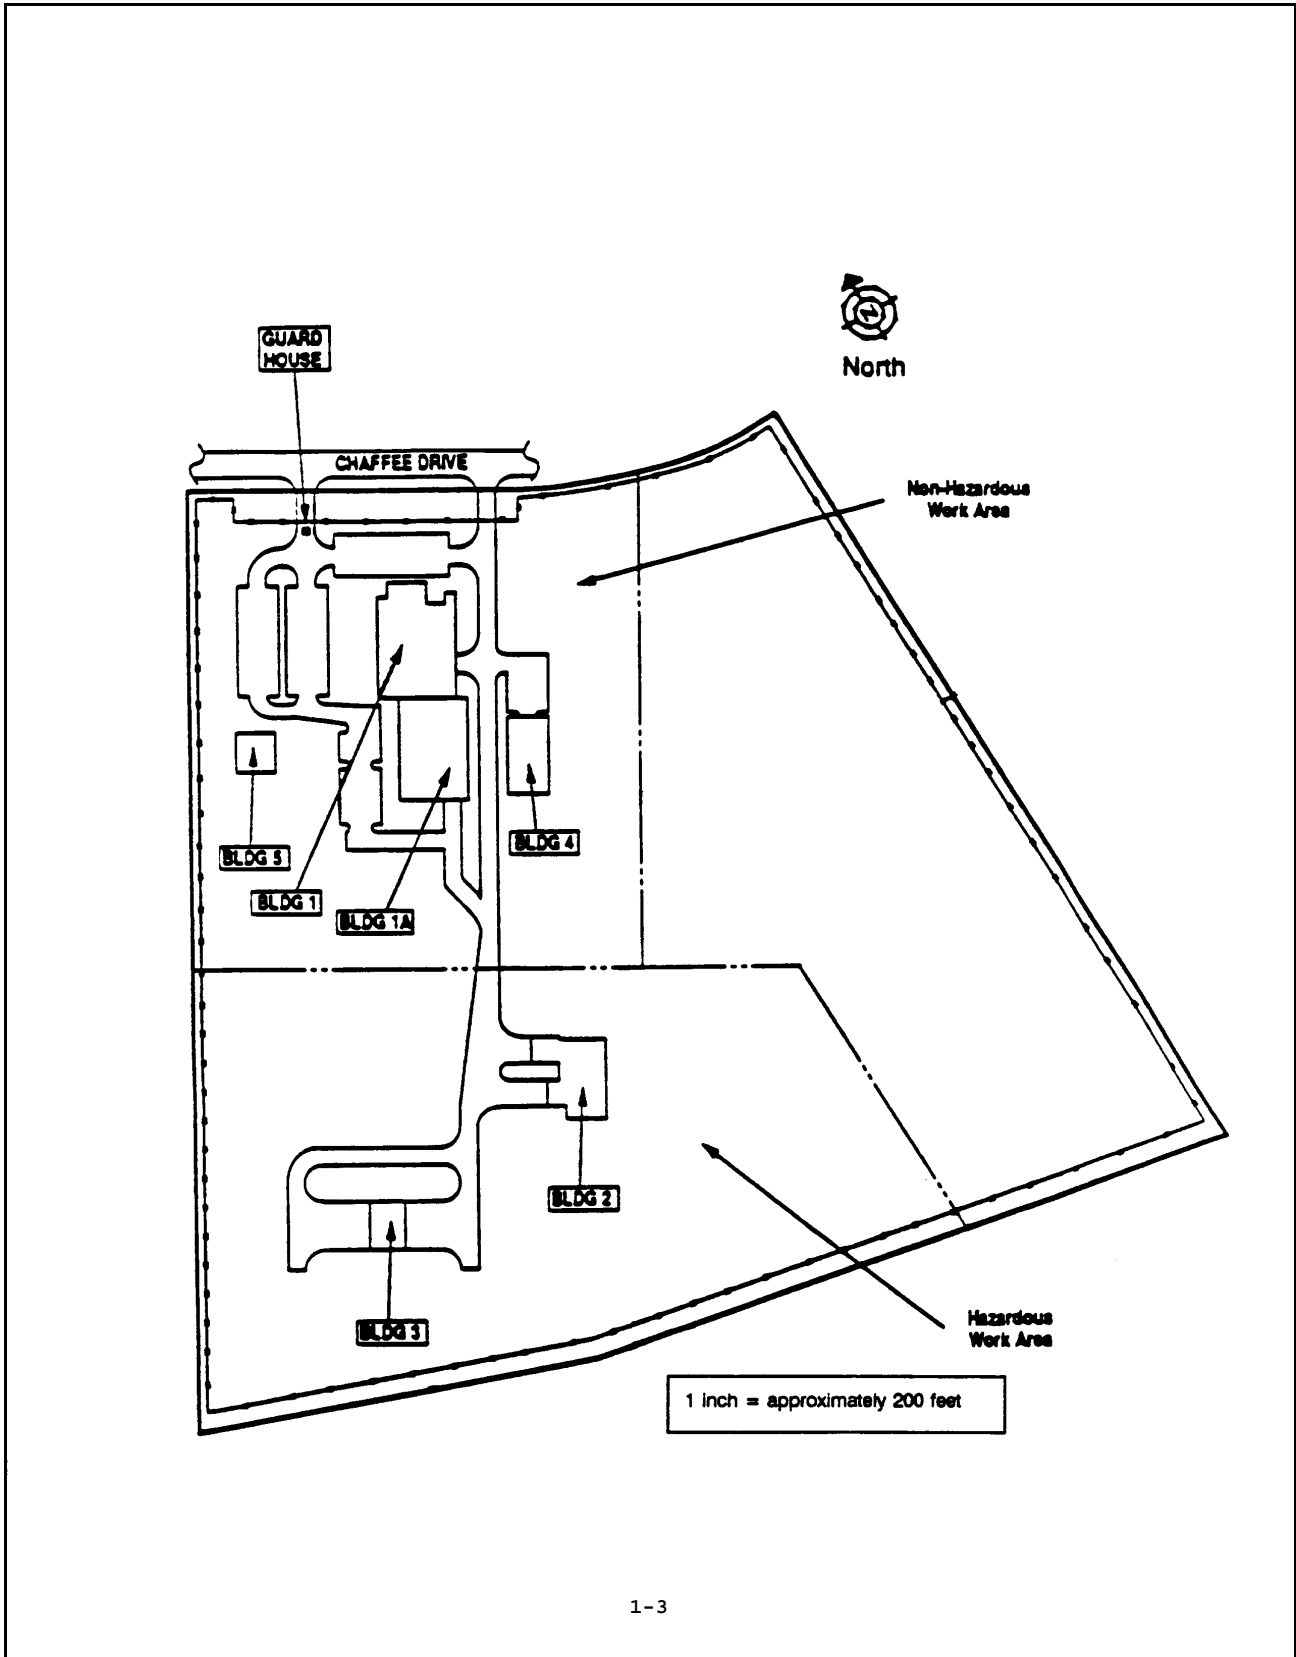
LAYOUT OF BUILDINGS AT SITE
